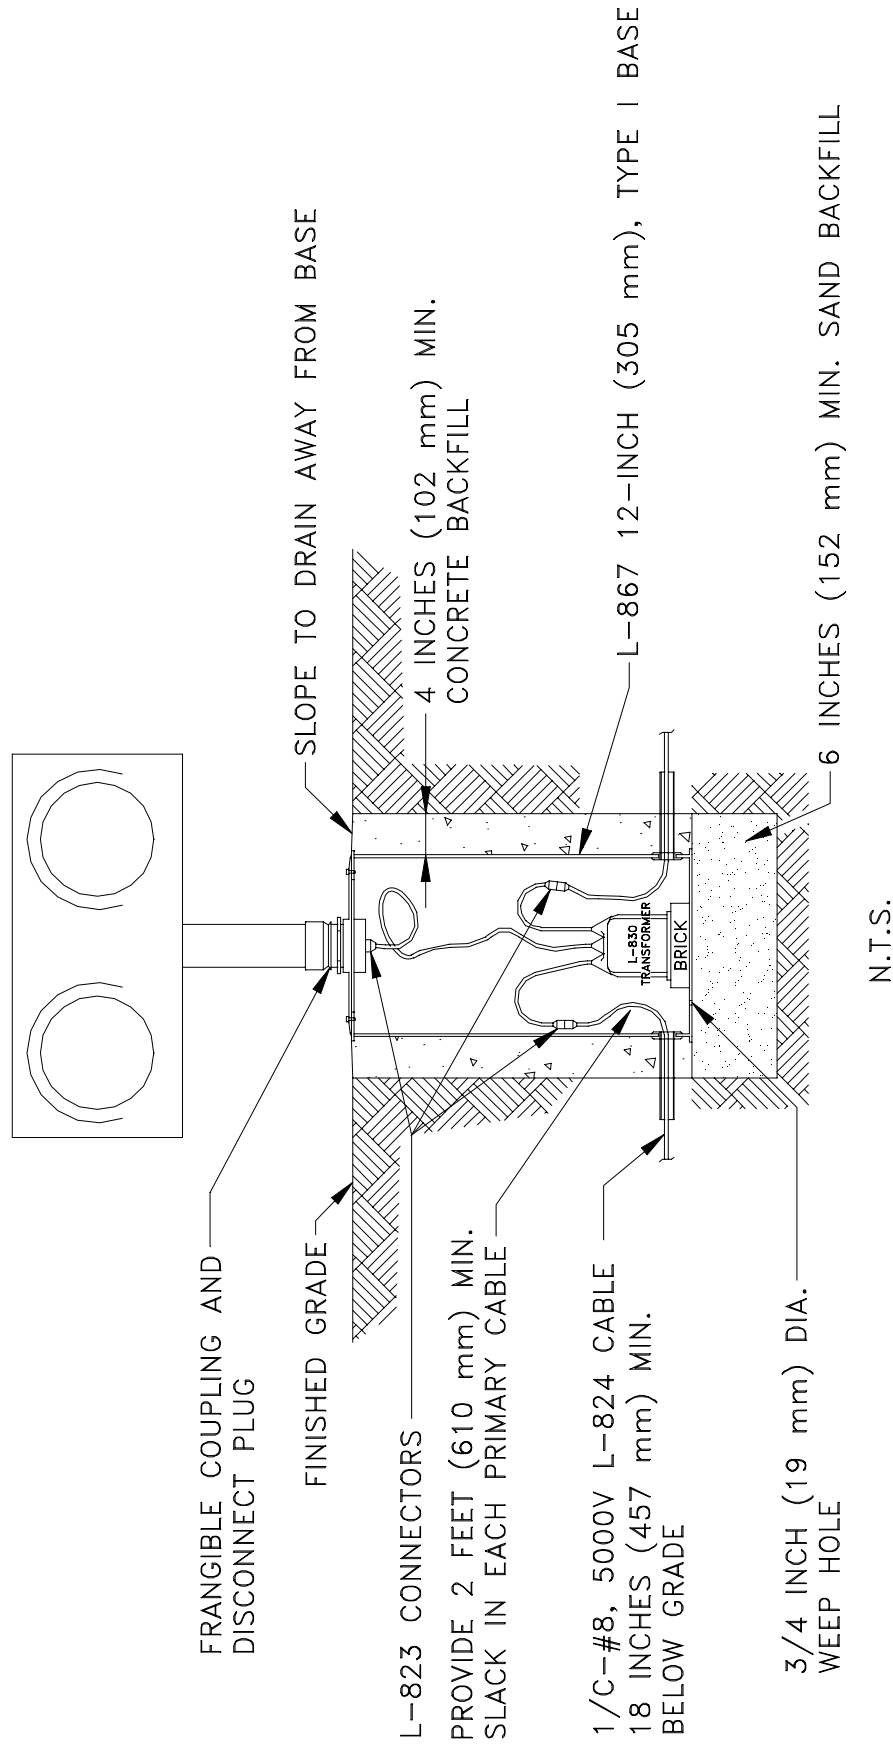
TYPICAL ELEVATED RGL INSTALLATION DETAILS
